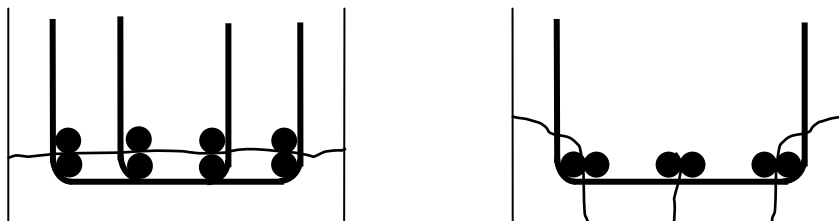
Cracks (Potential Cracks) created in Lapped Bars Intercepted by Transverse Reinforcements
